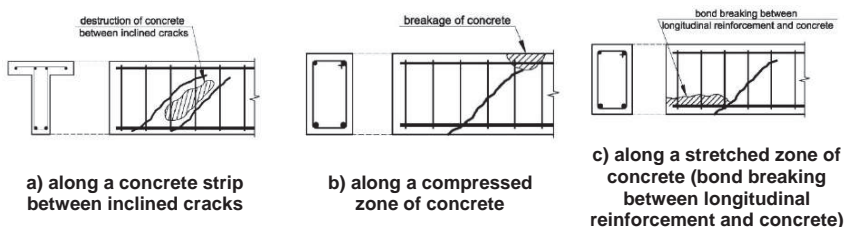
Schemes of a reinforced concrete element destruction along an inclined section
